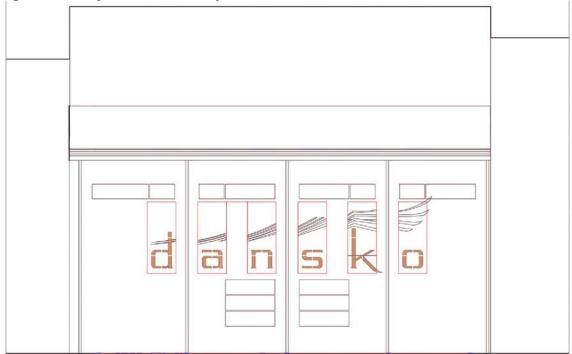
Façade Luminaire Layout – Version 2 Elevation
